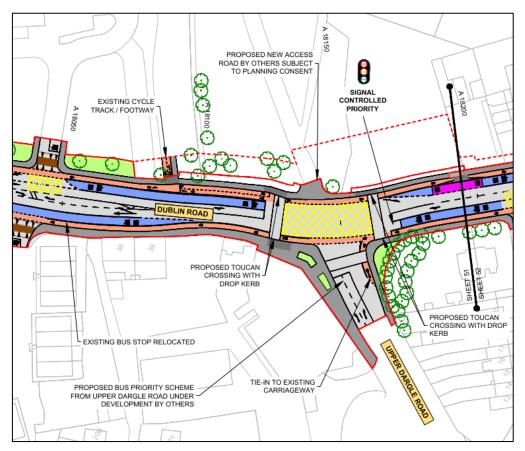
Extract from General Arrangement Drawings at Dublin Road / Upper Dargle Road (Sheet 54)
